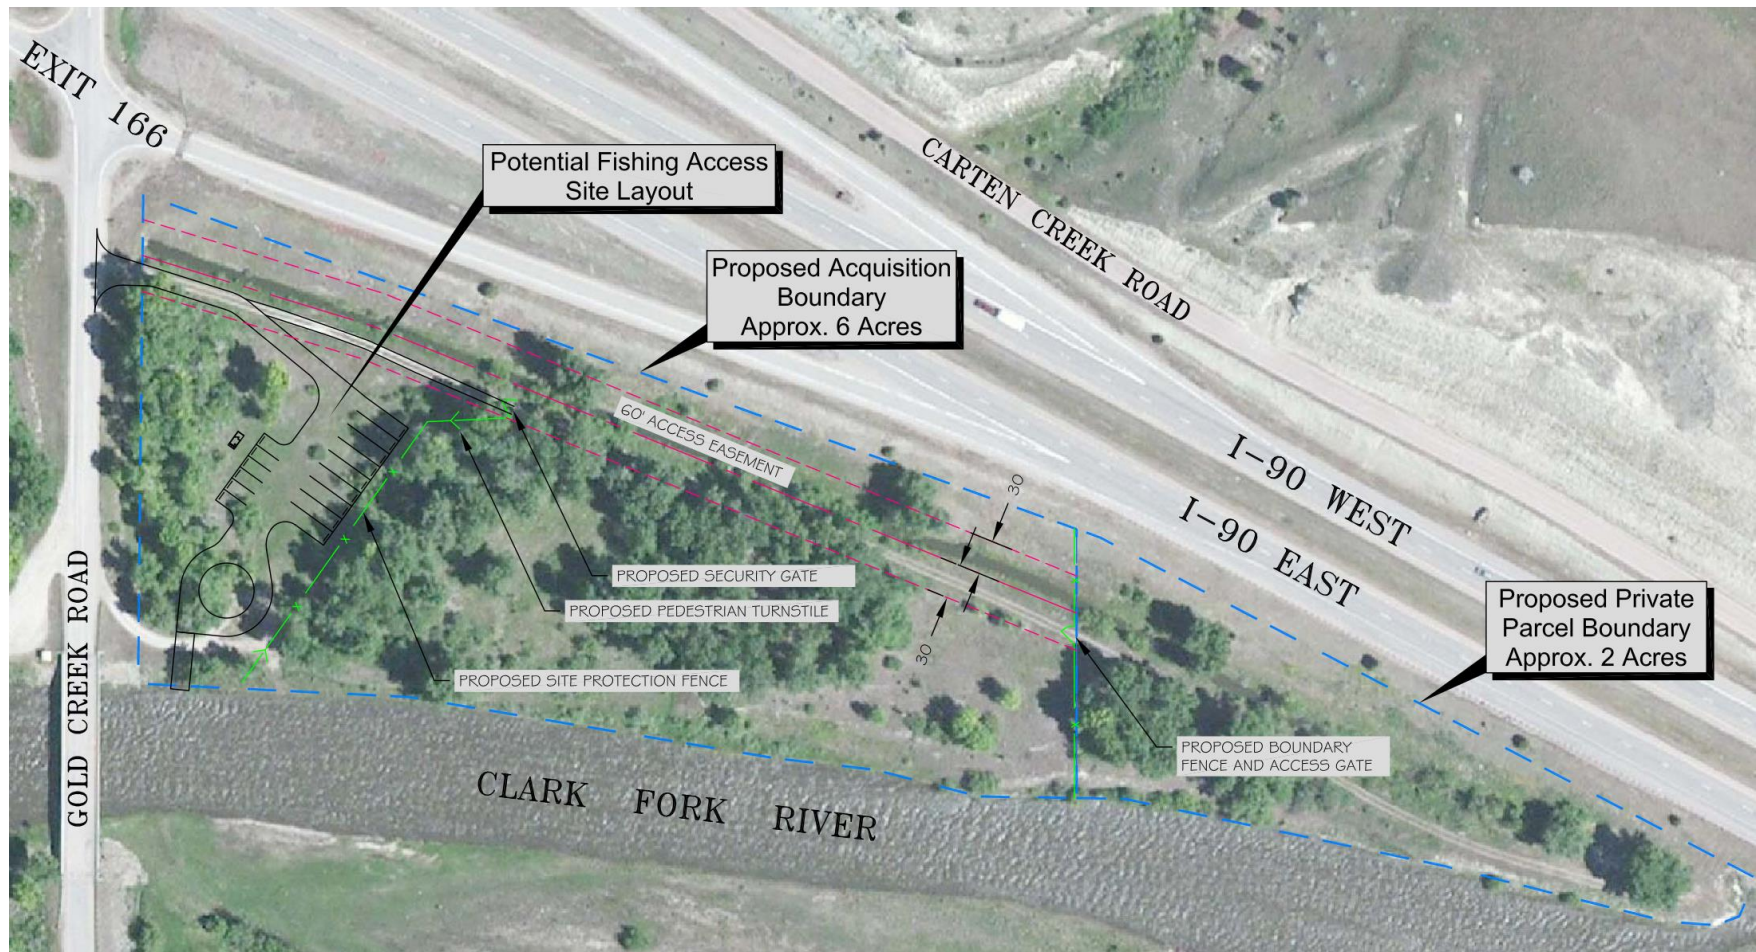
Preliminary Concept Site Plan for proposed Gold Creek FAS
